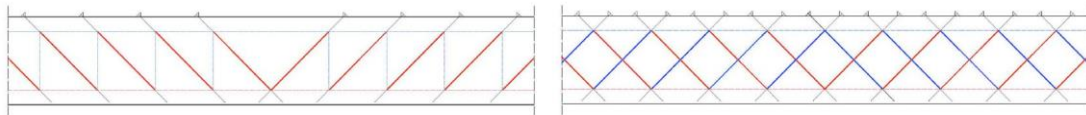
Arrangements of shear reinforcement proposed by Trautz and Koj (2009): diagonal reinforcement (left) and nested diagonal reinforcement (right).
